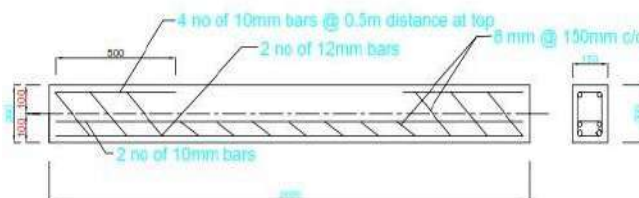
DOUBLY REINFORCEMENT WITH CONFINEMENT ZONE REINFORCEMENT DETAILS
